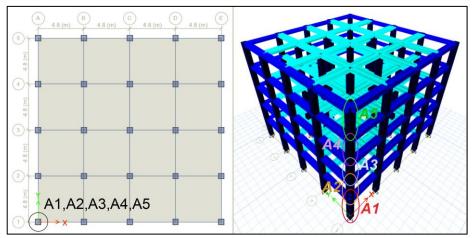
Building plan with marked removed columns (left); Structure model (right)
